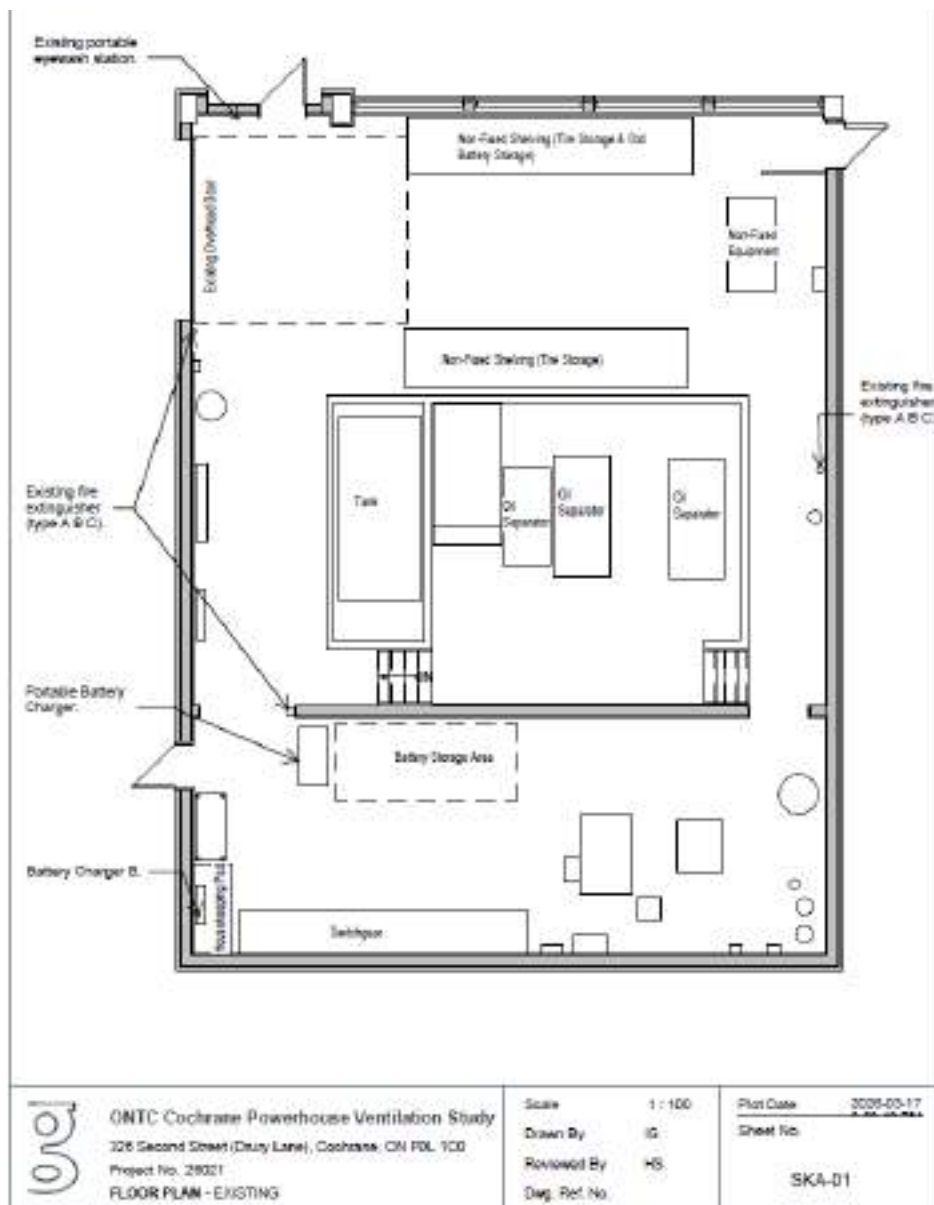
Existing Floor Plan created by G Architects as part of the Cochrane Powerhouse Study
